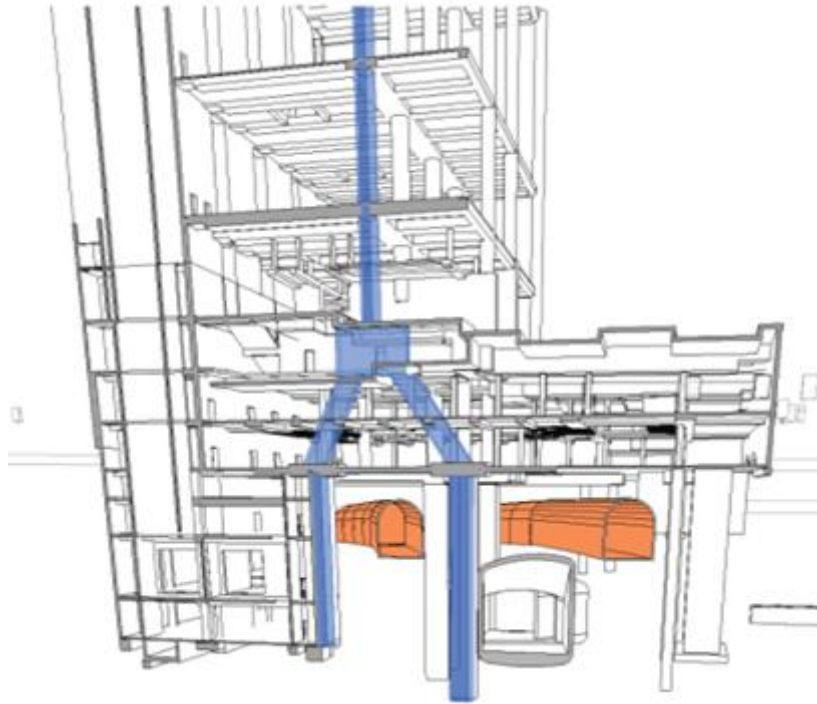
Indicative section through the structure showing South Tower column bifurcating through the station to straddle the ESL tunnel.
